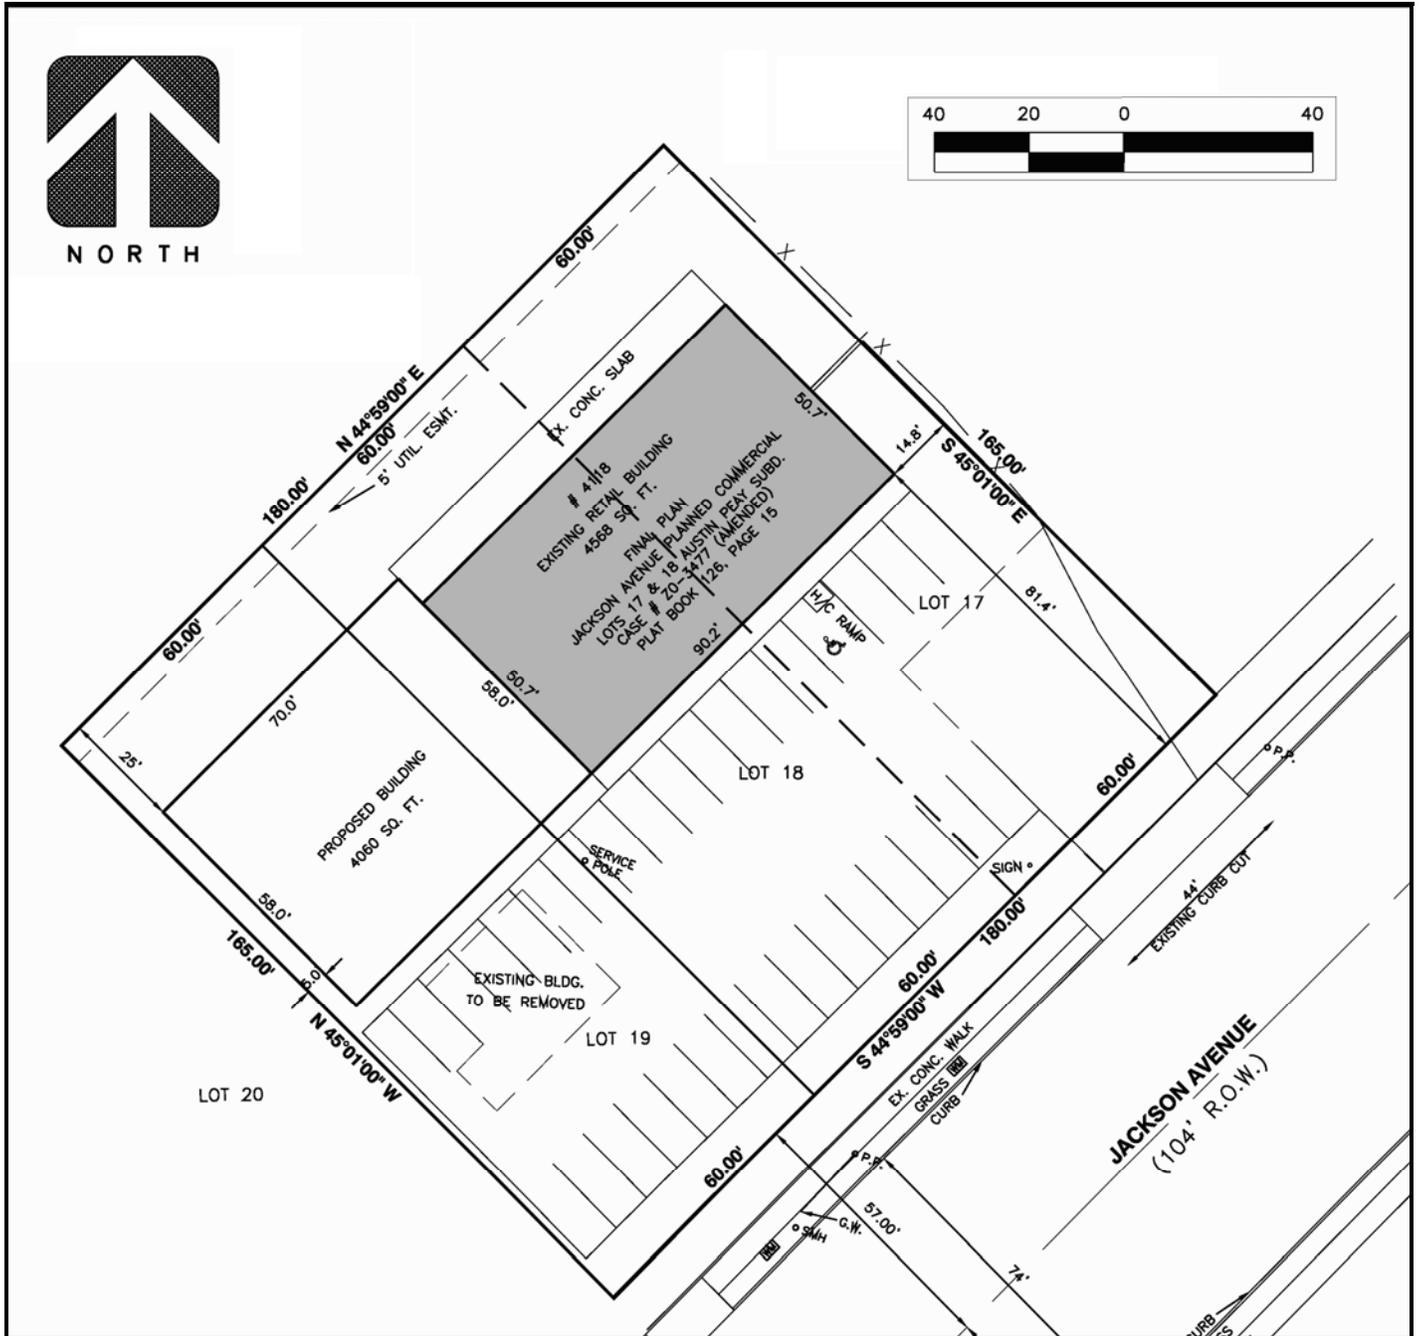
Proposed Site Plan for 4114 & 4118 Jackson Avenue
